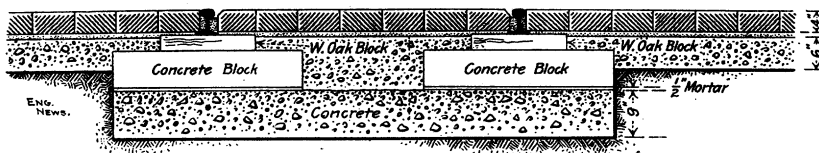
Section of Track Showing Use of Concrete Ties, Pere Marquette Railway.
